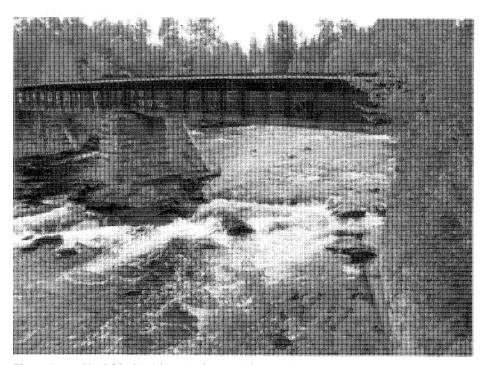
Big Eddy Rapids 1: Railway Bridge Looking Upstream
